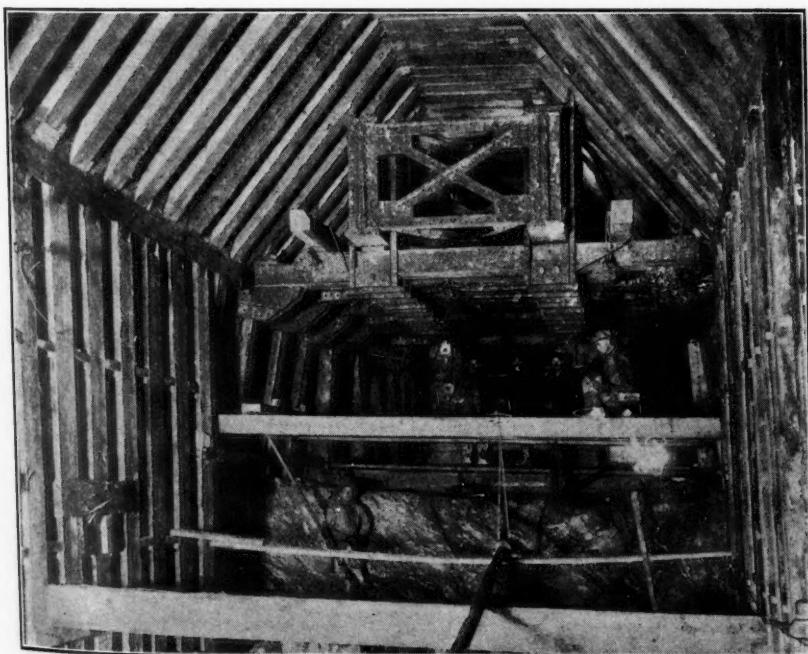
MOFFAT TUNNEL, WEST PORTAL, SHOWING LEWIS TRAVELING CANTILEVER NEEDLE-BAR, LOOKING TOWARD HEADING.
